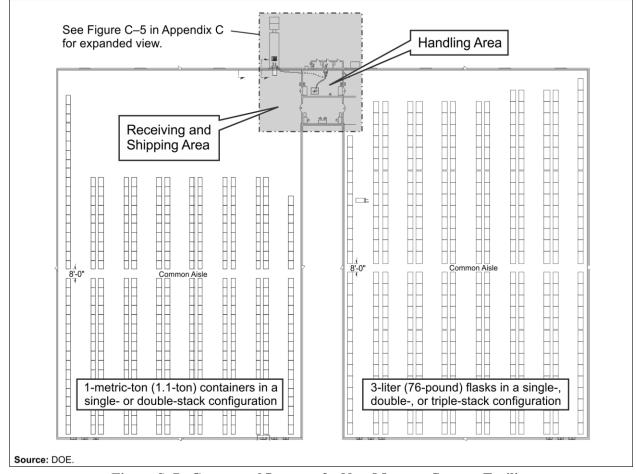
Conceptual Layout of a New Mercury Storage Facility
